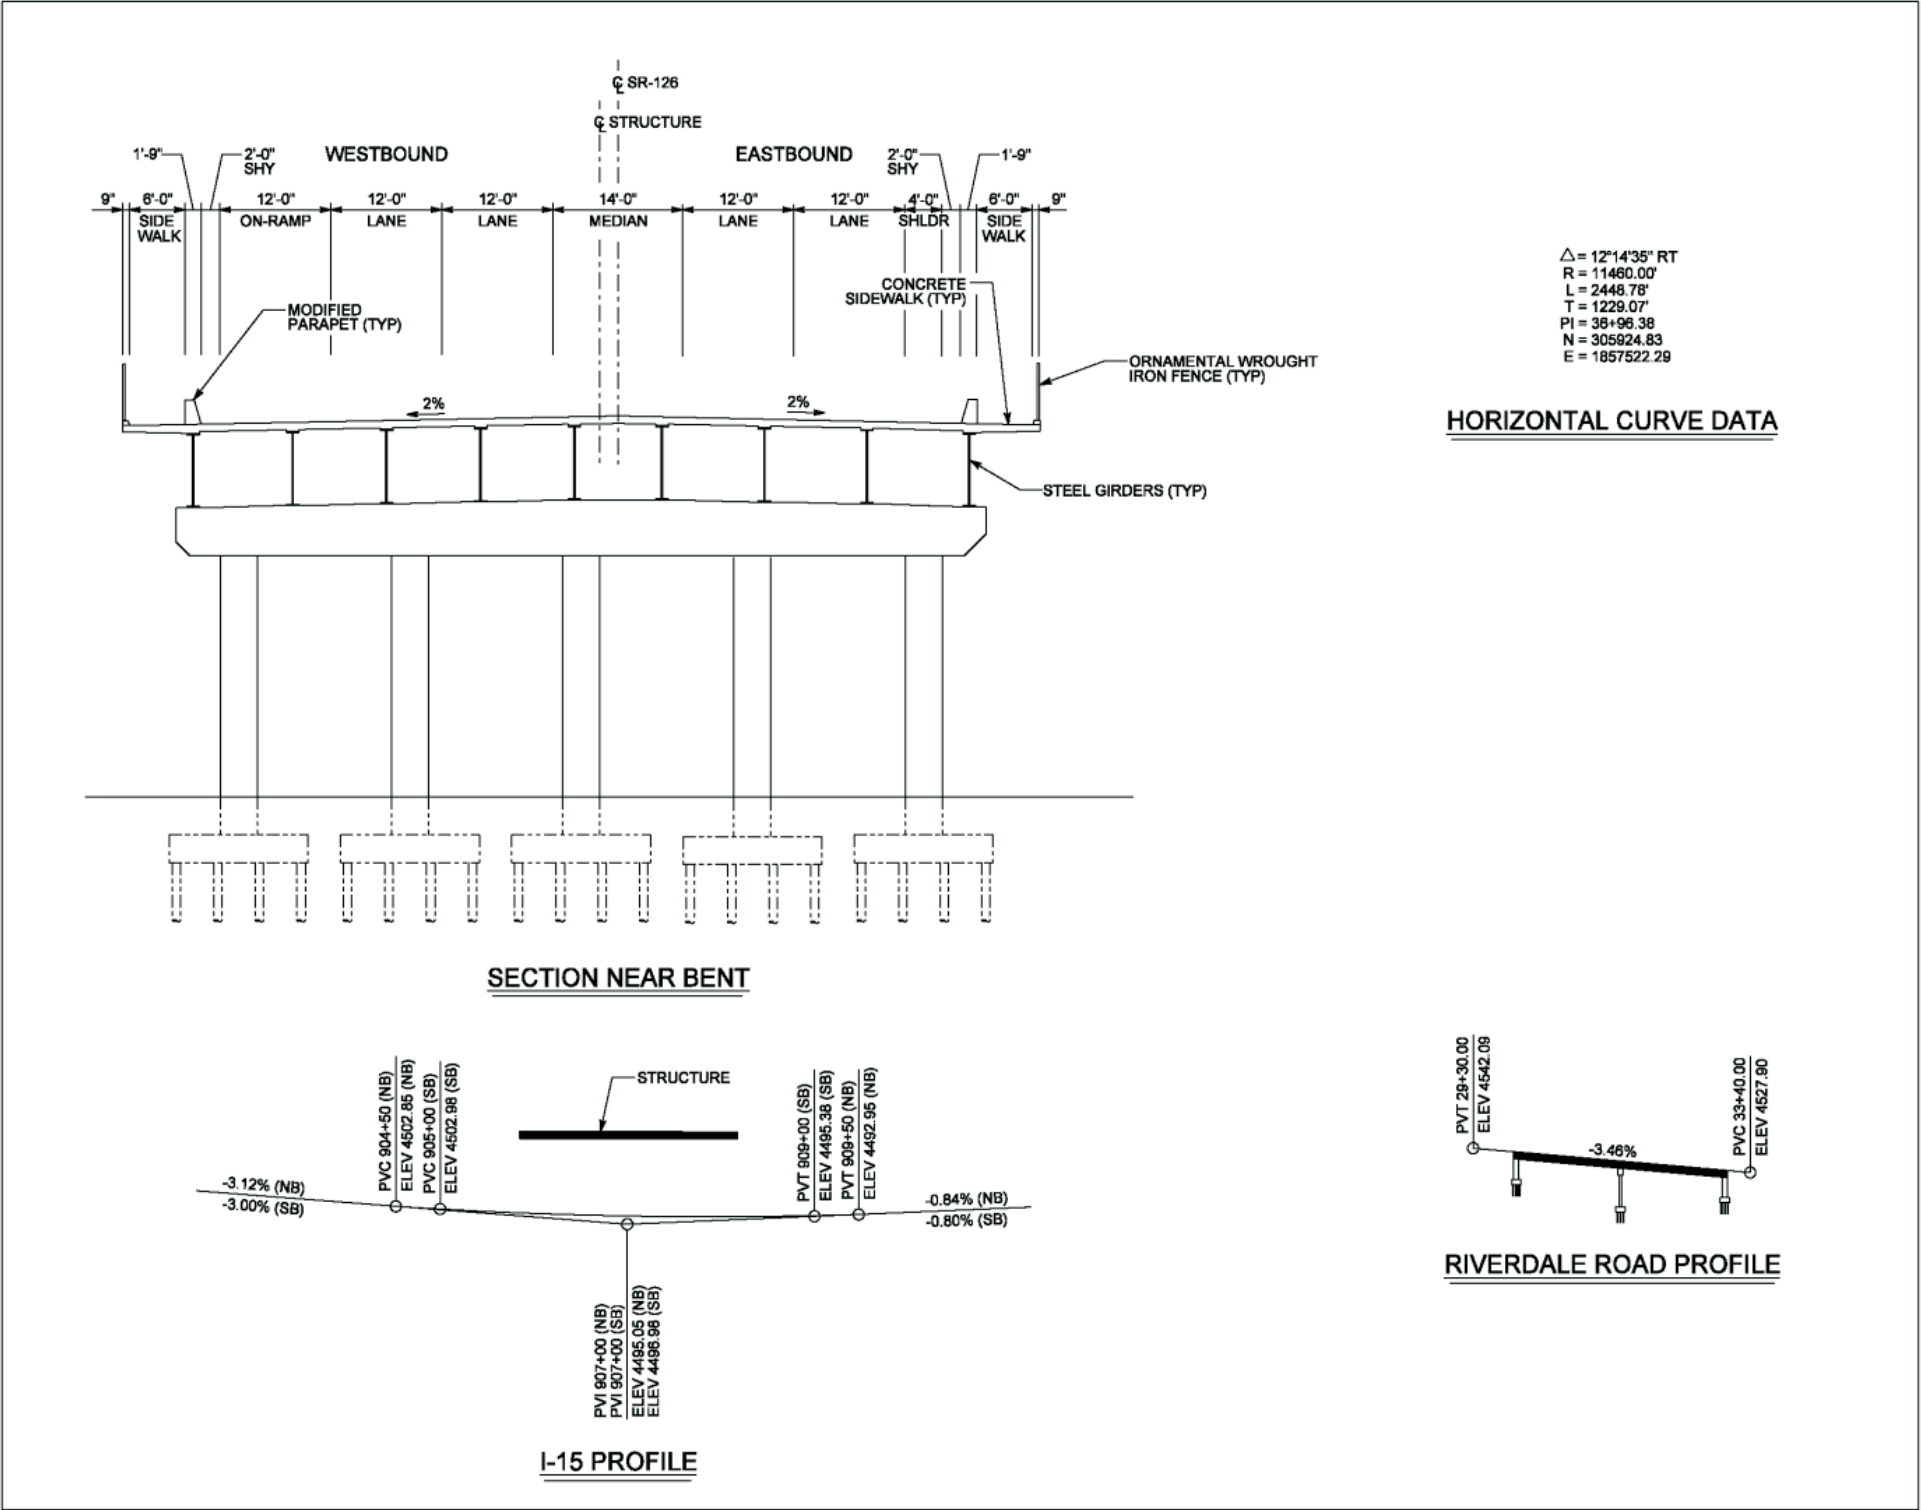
Preliminary Layout of I-15 Bridge (Page 2 of 2).
